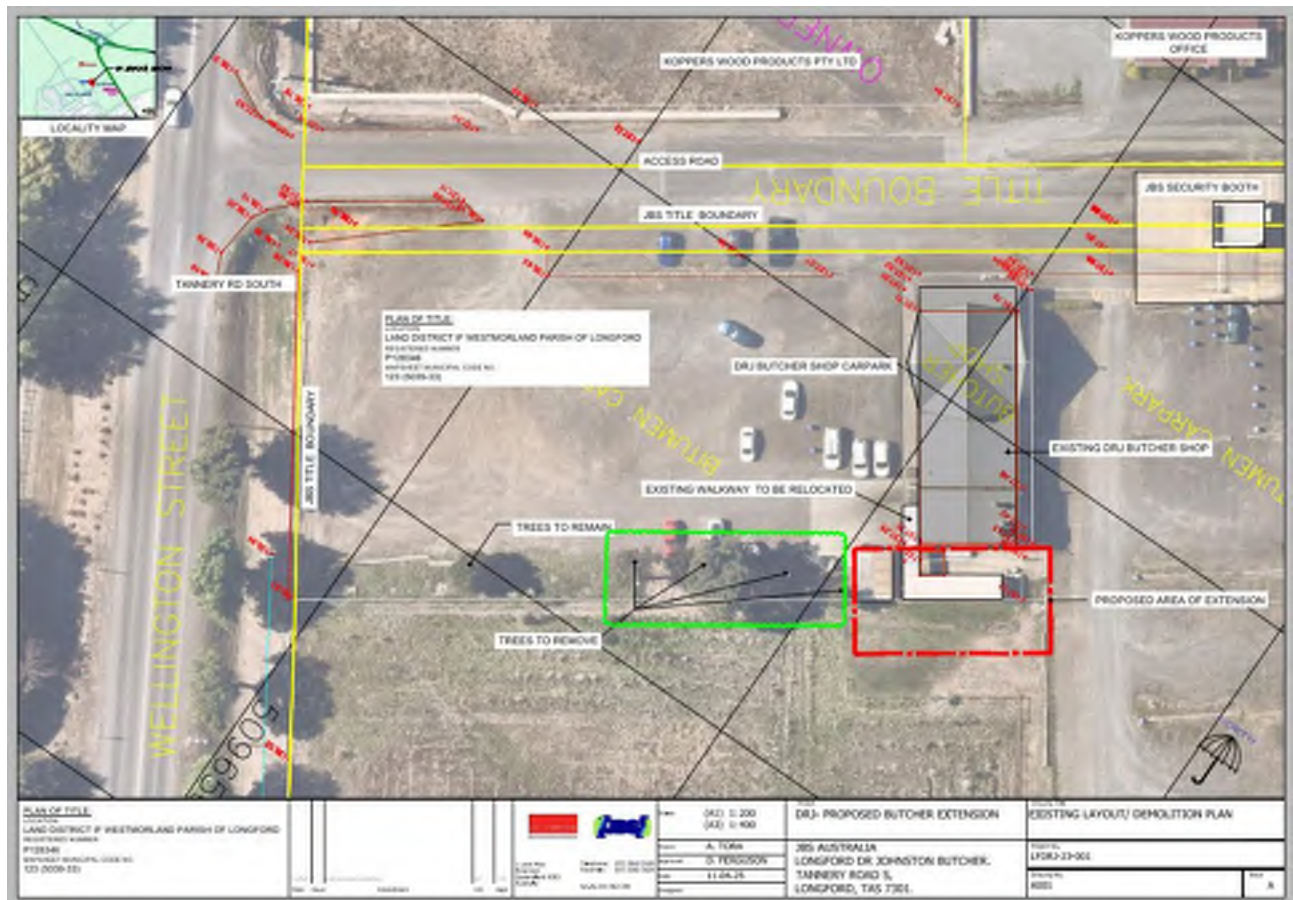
Overview of proposed development. Reproduced from the original source – EXISTING LAYOUT / DEMOLITION PLAN, DWG A001, JBS April 2025.
